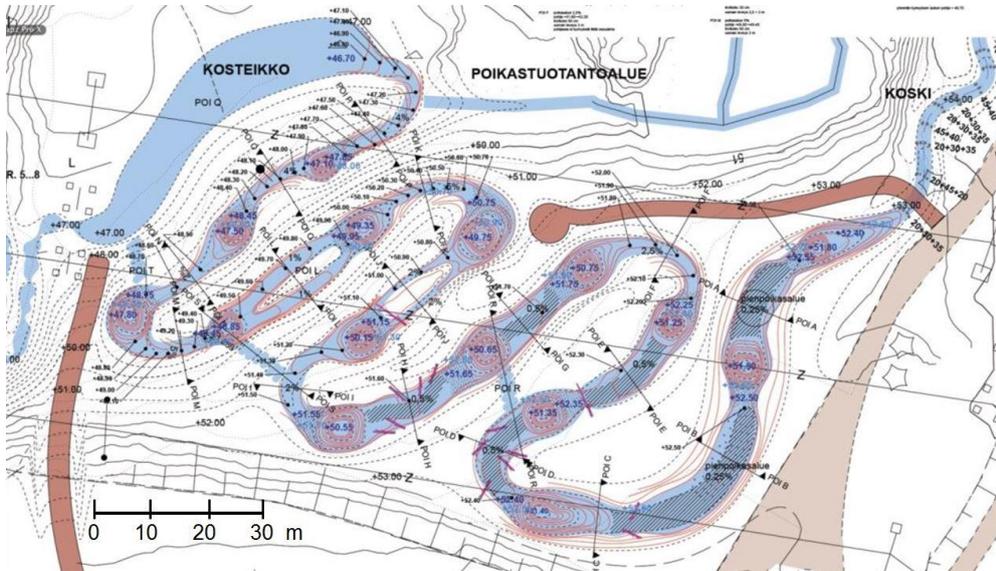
Plan of the habitat section with contours, elevation points and gradients
